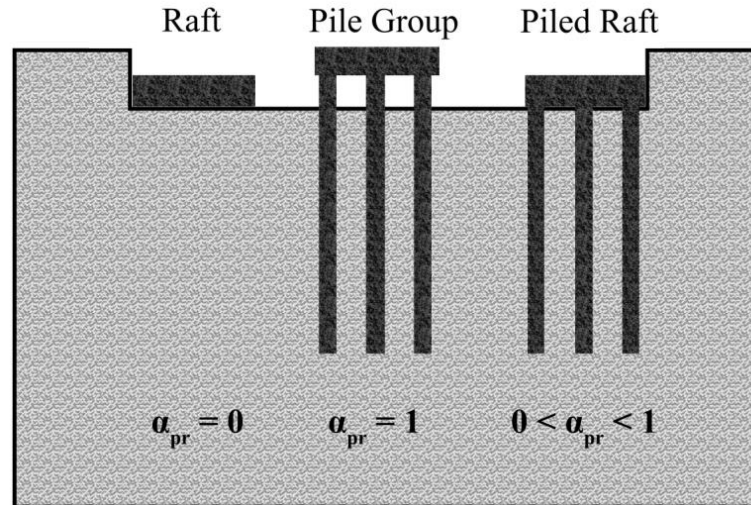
Raft, pile group and piled rafts foundation systems (after Mandolini, 2003)
